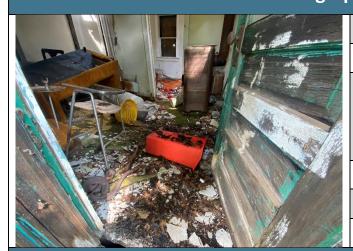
Front View Photograph #2 Left View Photograph #3 Rear View
